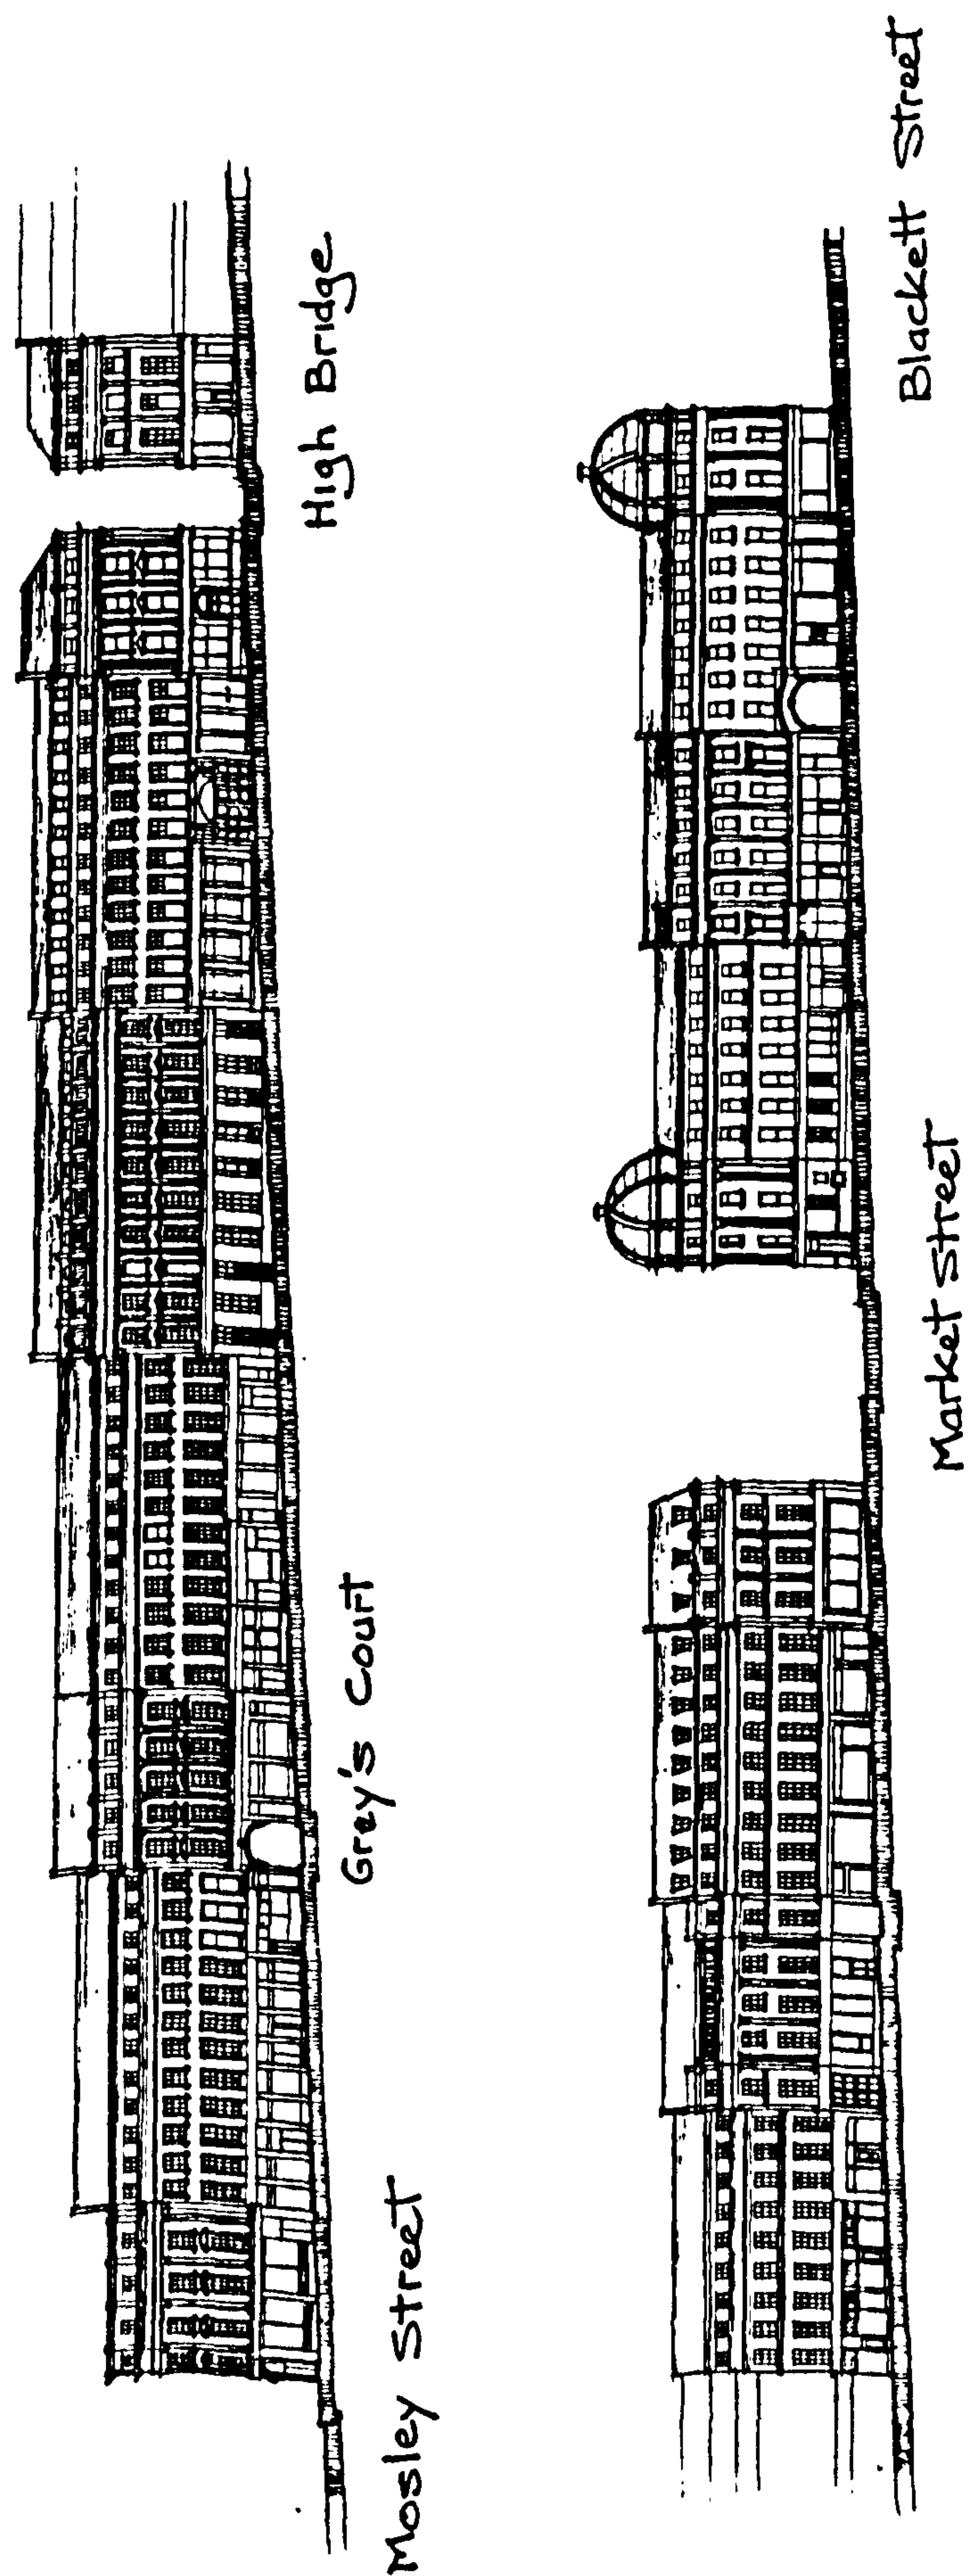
GREY STREET WEST SIDE ELEVATIONS 1991
